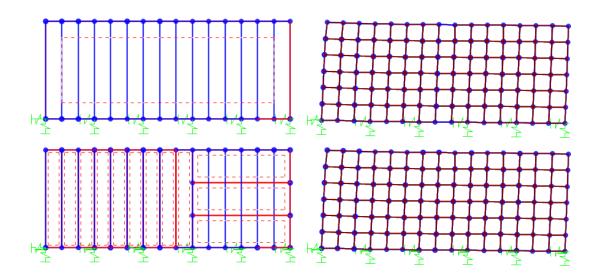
Top: wall with single shell element. Bottom: Wall with several shell elements. Both walls have the same deflection when subjected to similar loading.
